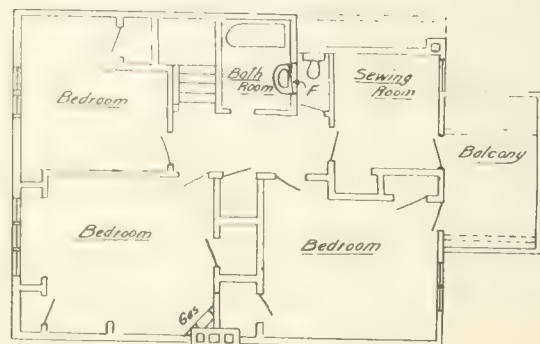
Bedroom floor plan of house shown in Fig. 1.
